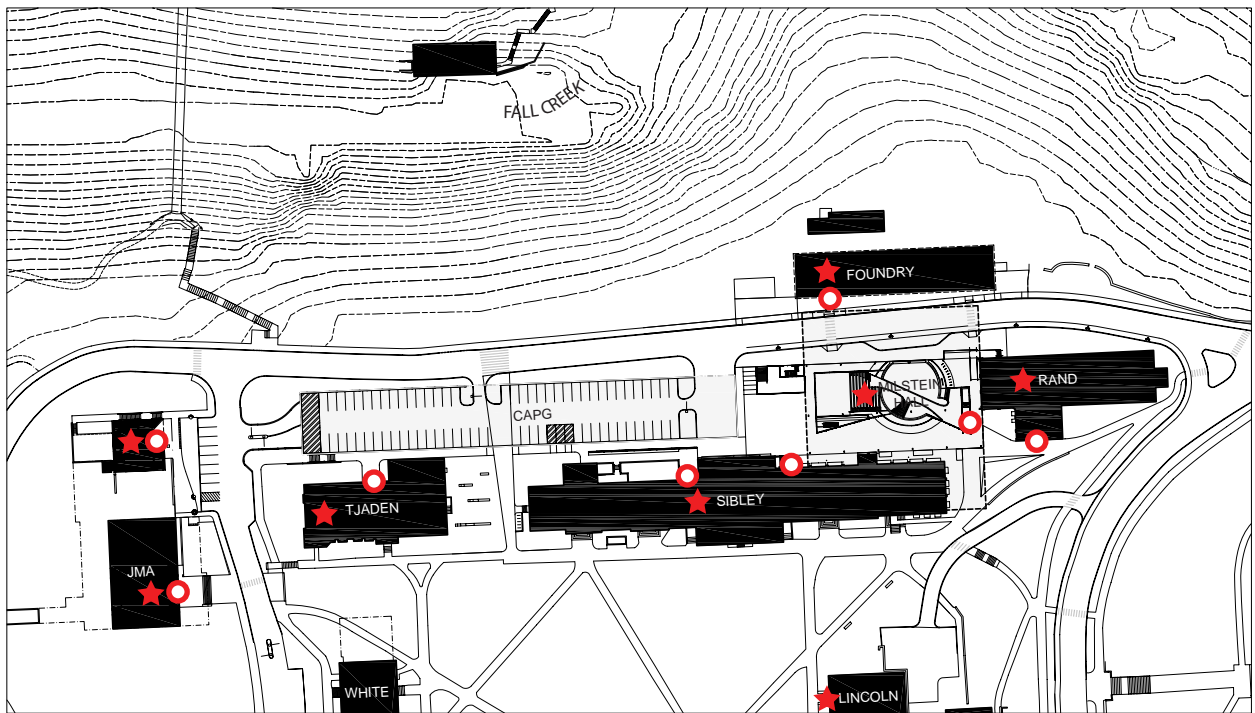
Proposed ADA-accessible buildings and entrances.
